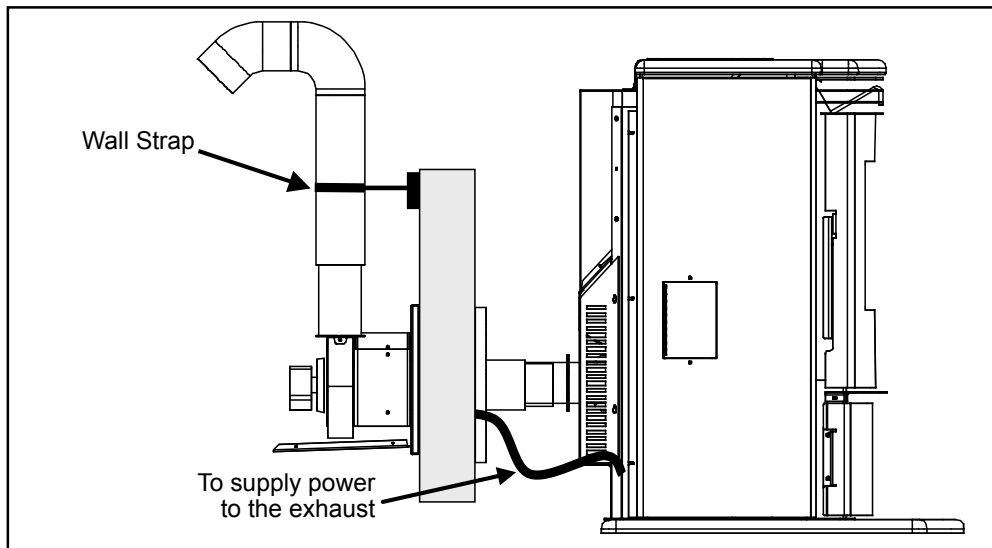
Through Wall Installation with Exterior Blower Kit; Side View.
